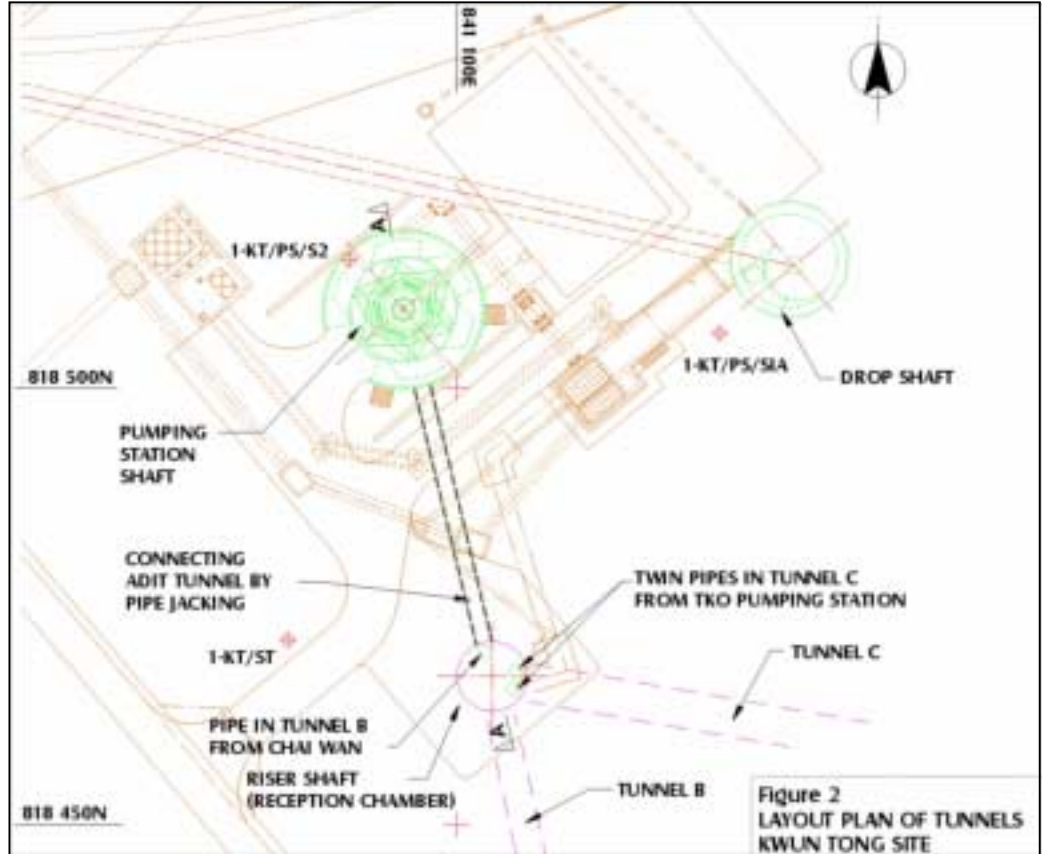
LAYOUT PLAN OF TUNNELS KWUN TONG SITE
